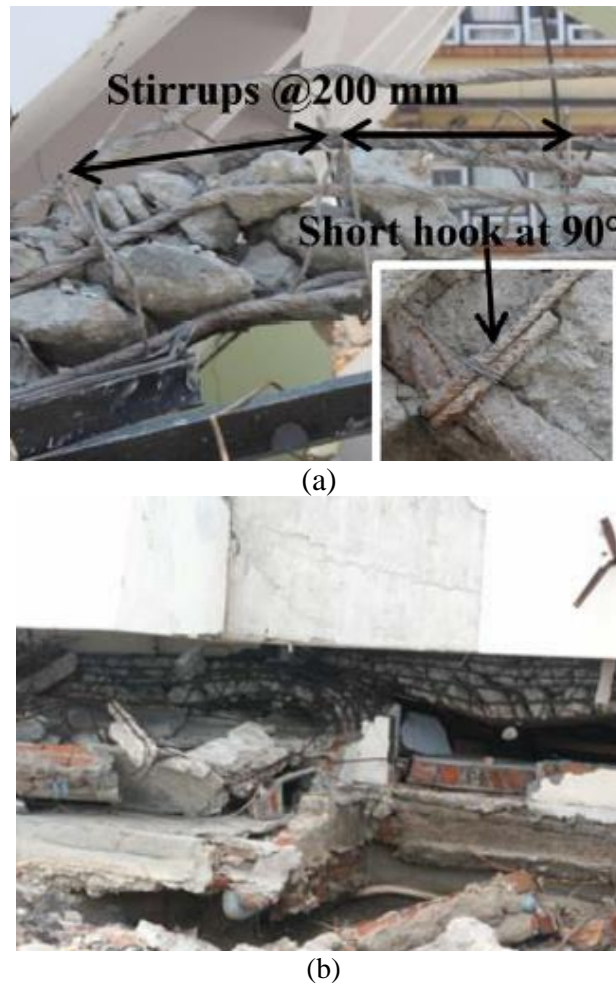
Large spacing between the stirrups lead to column failure; (a) damaged column during 2015 Gorkha Earthquake and (b) column failure lead to building collapses during 2004 Sumatra Earthquake and Tsunami (Saatcioglu *et al.*, 2005; Sharma *et al.*, 2016)
